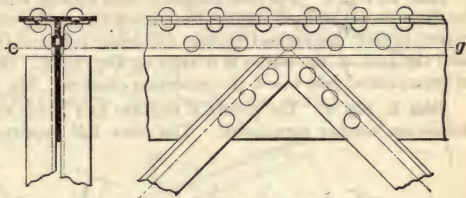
Riveted Truss-joint with Truss-diagram Lines
